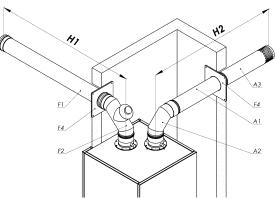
Horizontal outlet of air- flue gas system through the wall
